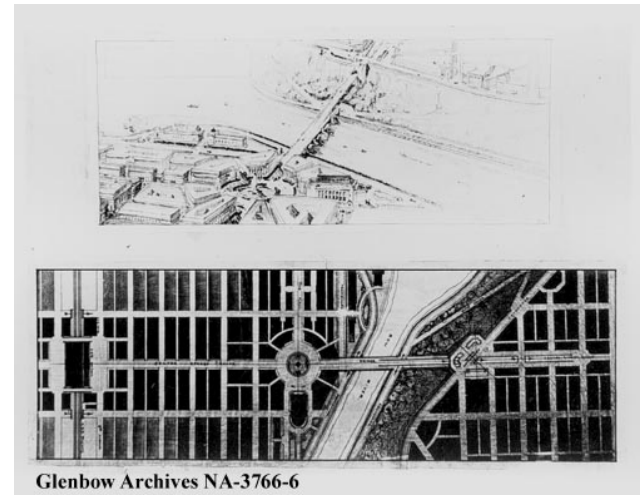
Early plans for the Centre Street Bridge include an automobile elevator.
